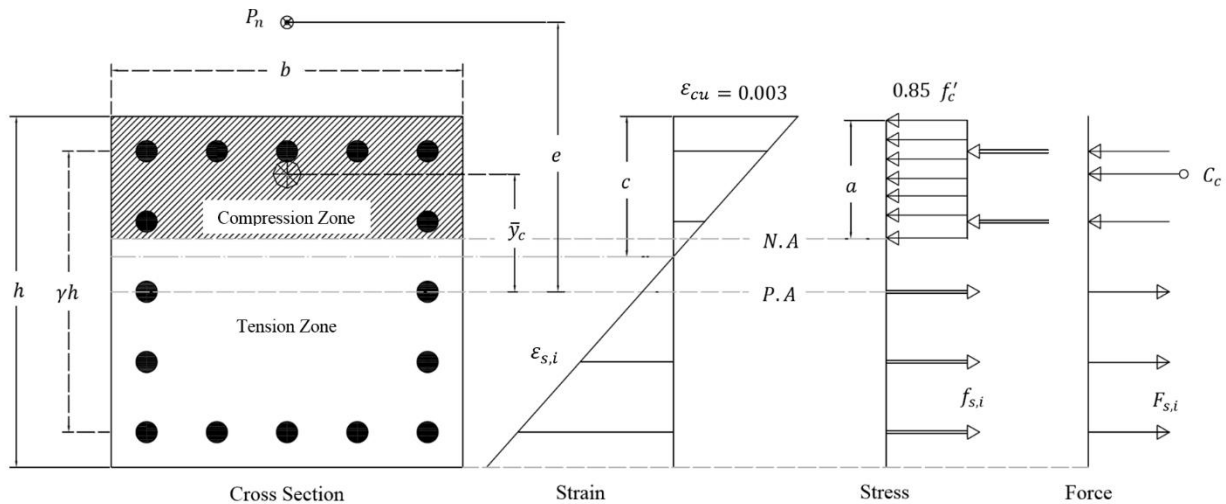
Schematic representation of distribution theory for a column with a typical cross-section under eccentric loading.
